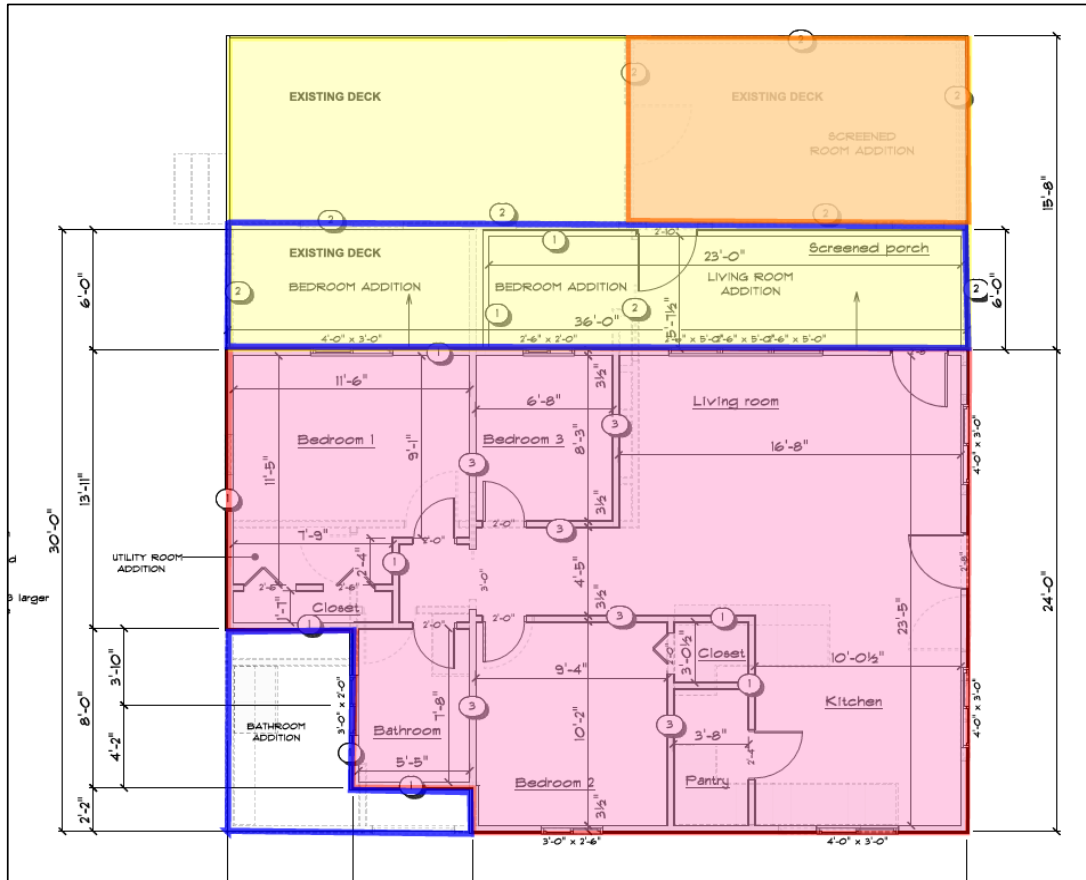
Sketch submitted with the application showing the existing dwelling (red area) and existing deck (yellow area). Also, shown is the proposed interior living space increase (blue outlines) and portion of the existing deck to be converted to a screen room (orange square).
